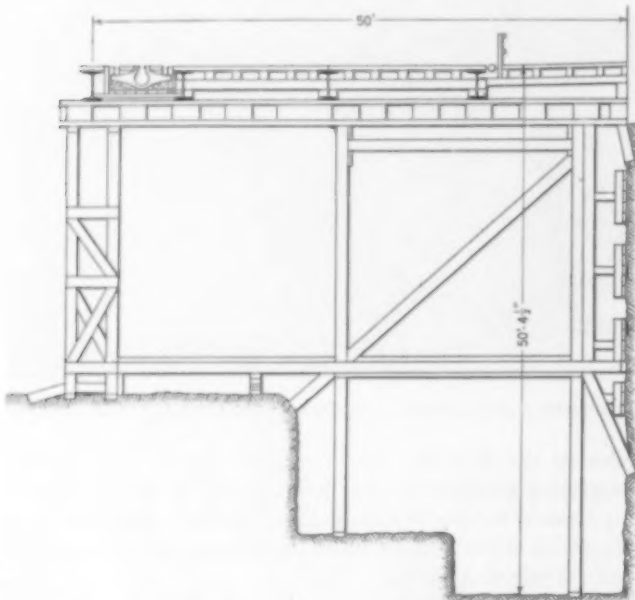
TYPICAL CROSS SECTION OF TIMBERING AND DECKING
